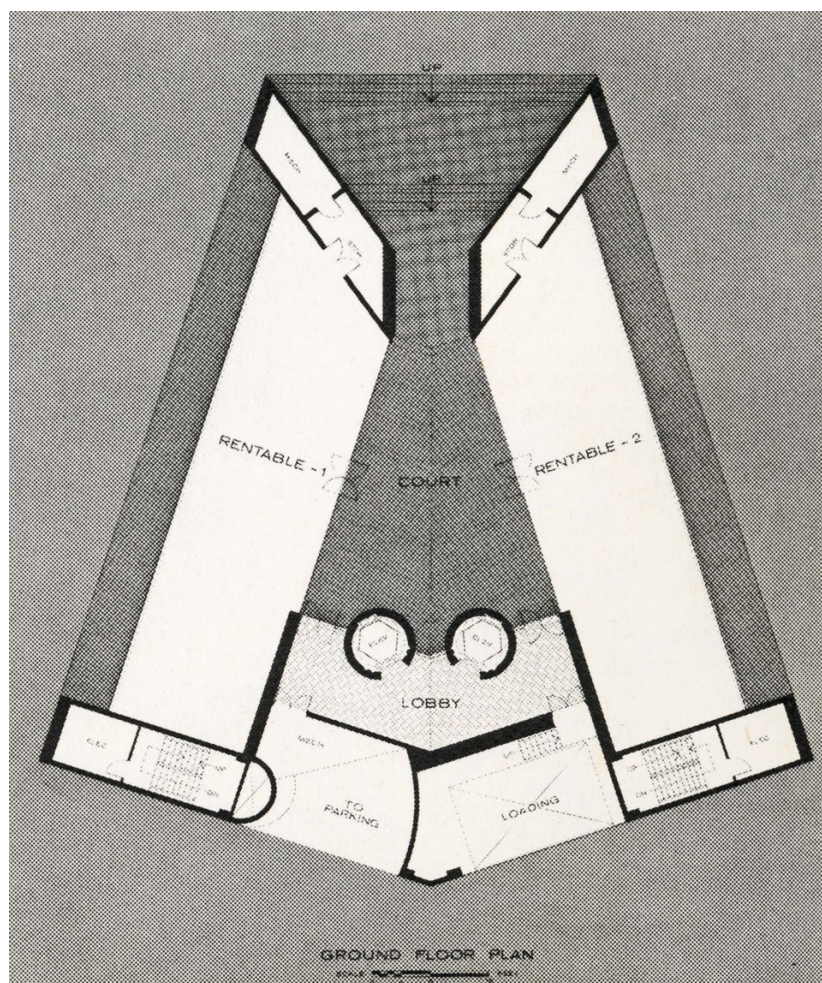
Ground floor plan (*Architectural Forum*, May 1972, 34).
